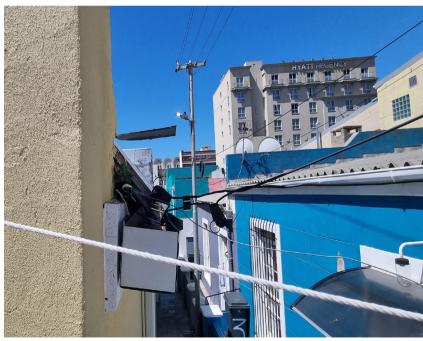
Image shows the exposed roof structure. Custom flashing to close off corner is recommended.
